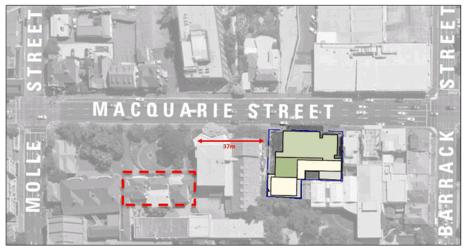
Distance between the site and 'Stephenville', illustrating the two existing buildings which provide a substantial visual buffer from the proposed development (source: JAWS Architects)
